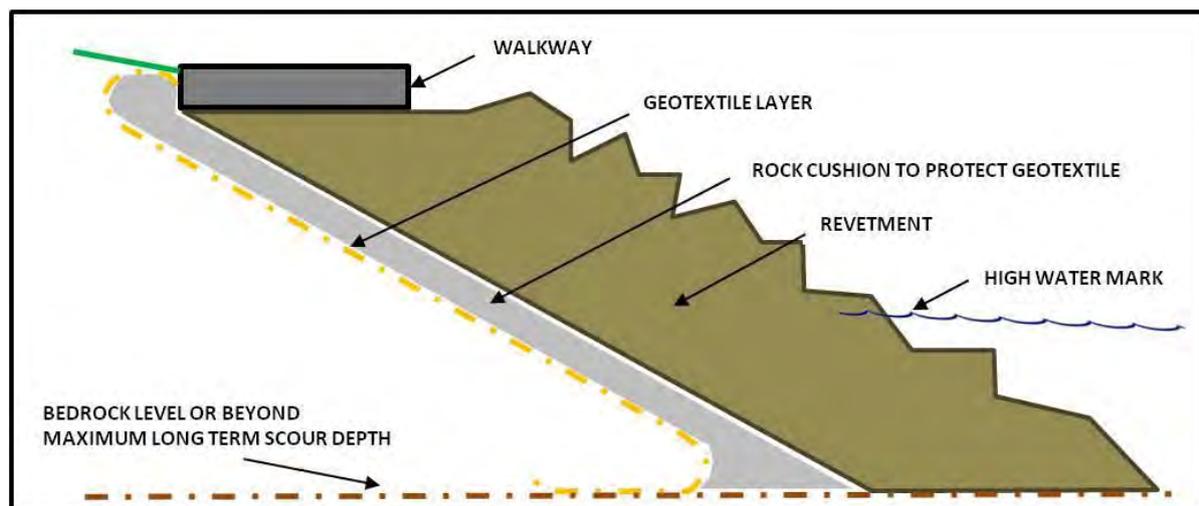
Design proposal 3 for the proposed Melck Street walkway: Rock revetment. Source: Common Ground Consulting (2013b).
